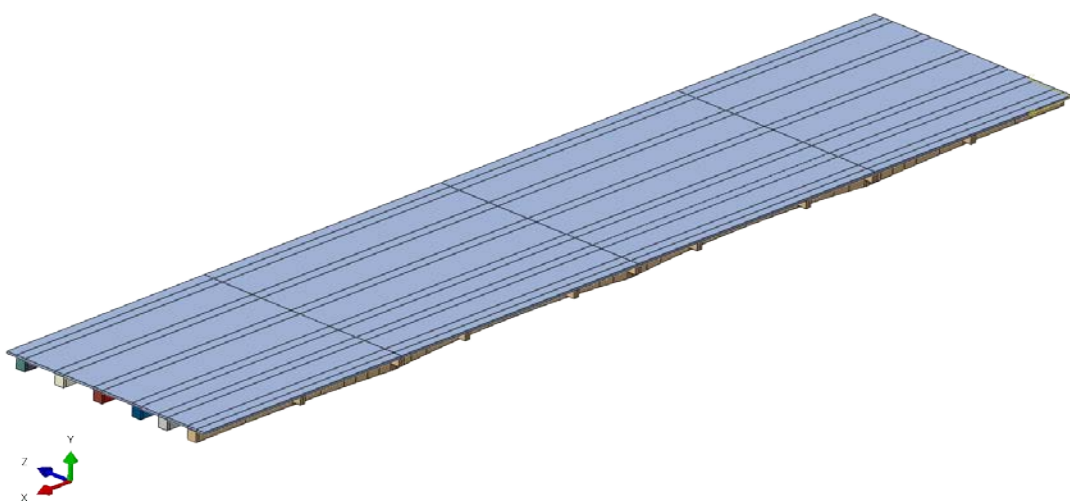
Bridge Assembly showing beam, deck and diaphragm
